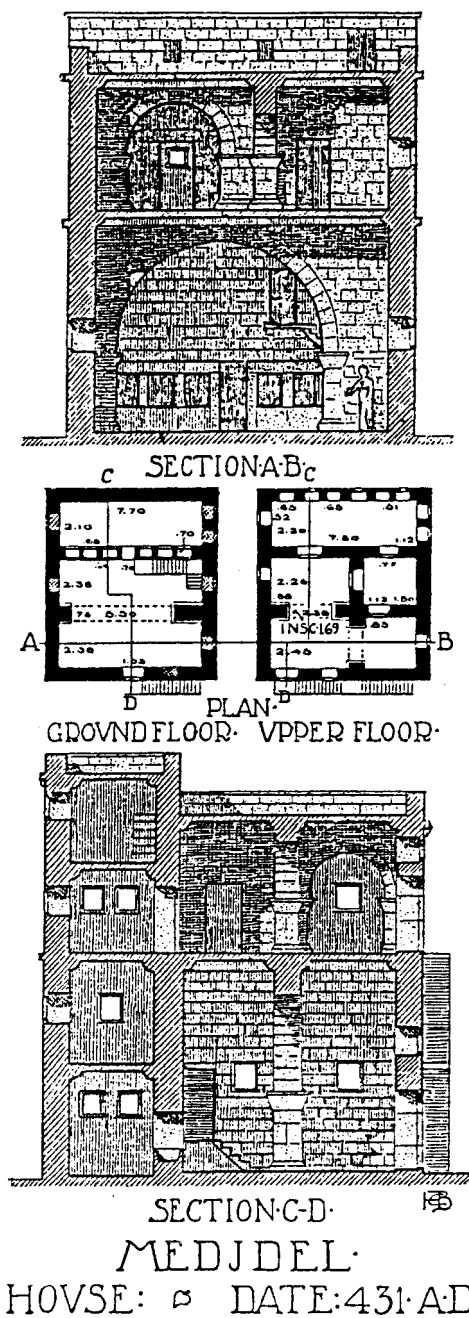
Il Medjdel. Plan and elevation of the house. After Ellis (2000).
